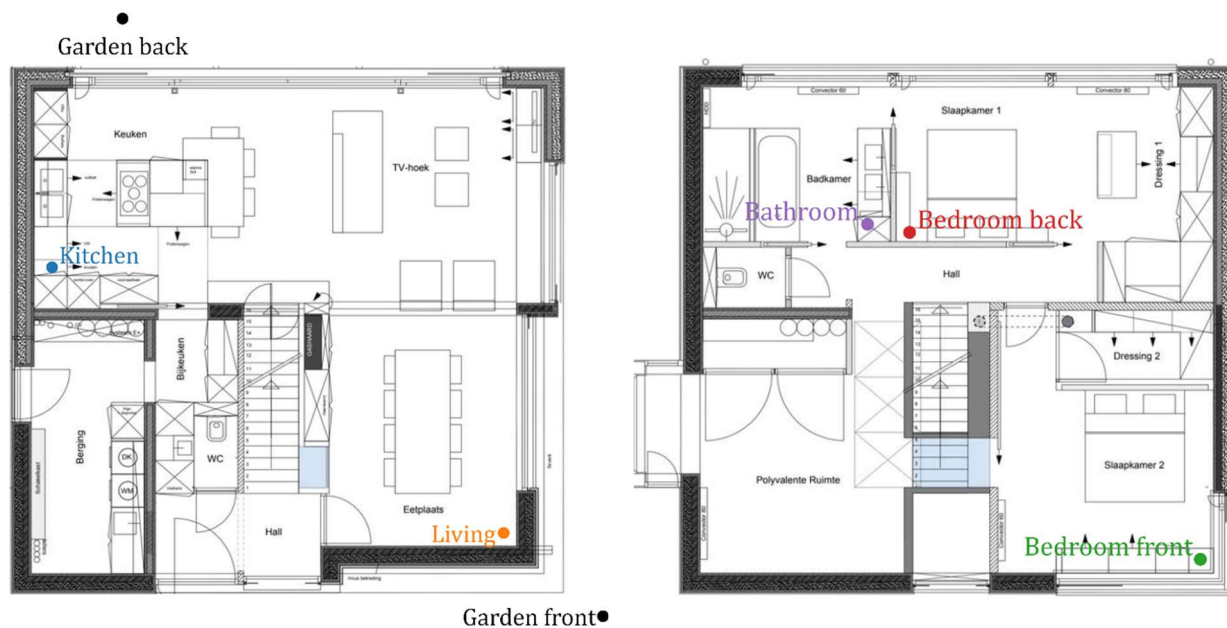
The building layout: left is ground floor, right is upper floor. The location of the PM measuring devices in and near the house are marked in colours.
